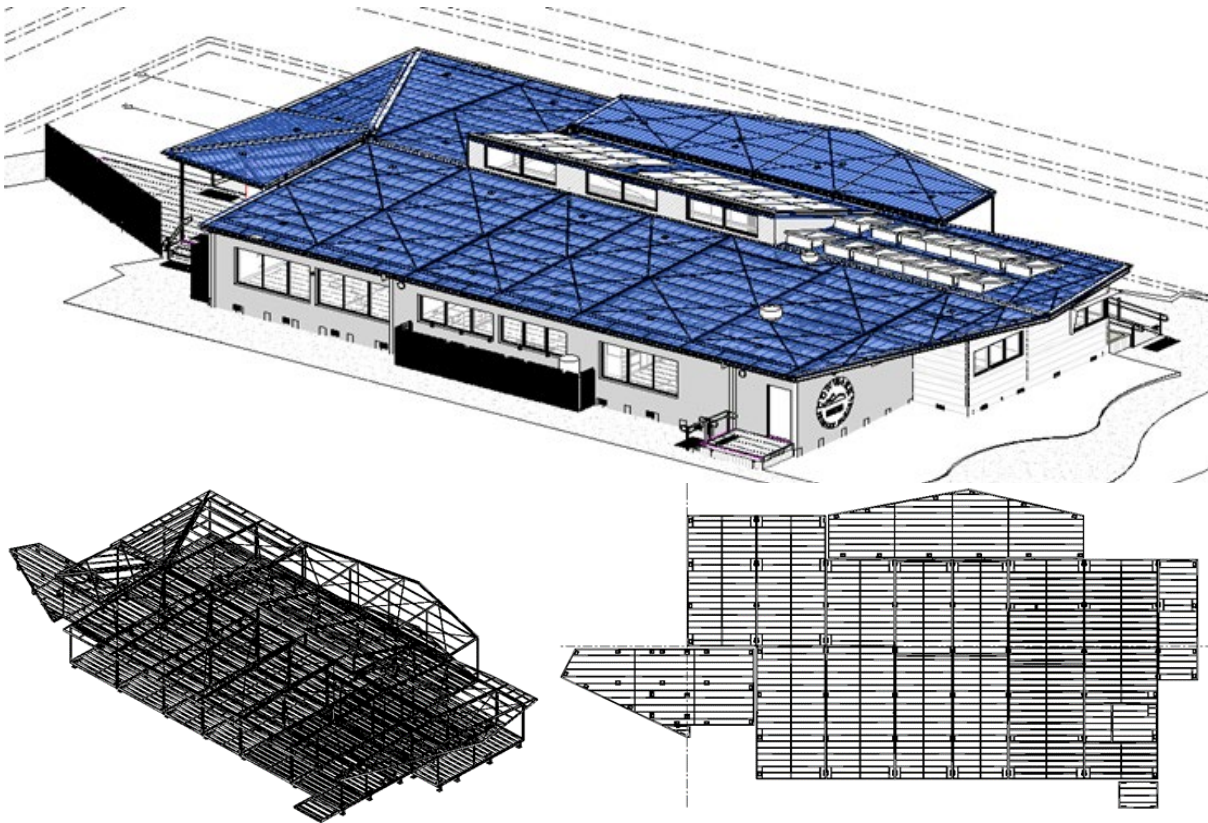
Structural model attached to central model, and 3D and plan views of the structural model
